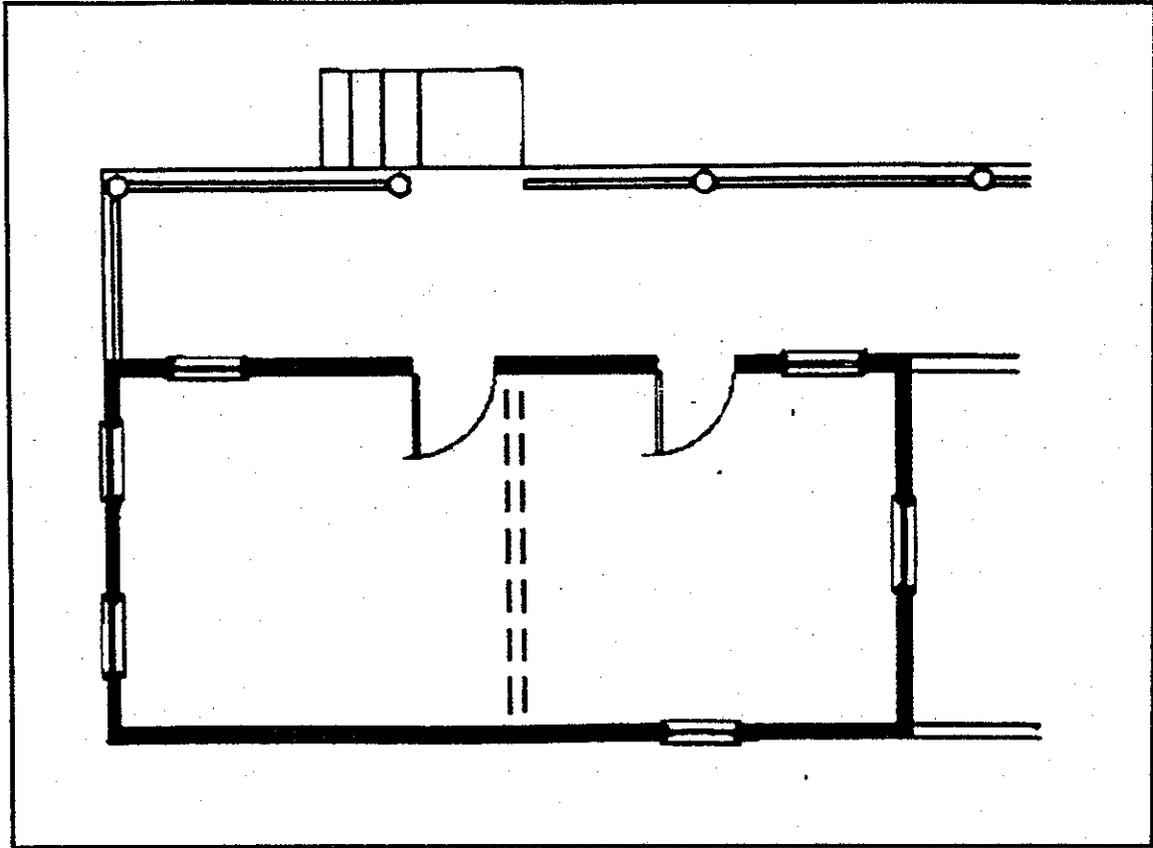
Charleston single house lot and plan, 176 Meeting Street.
